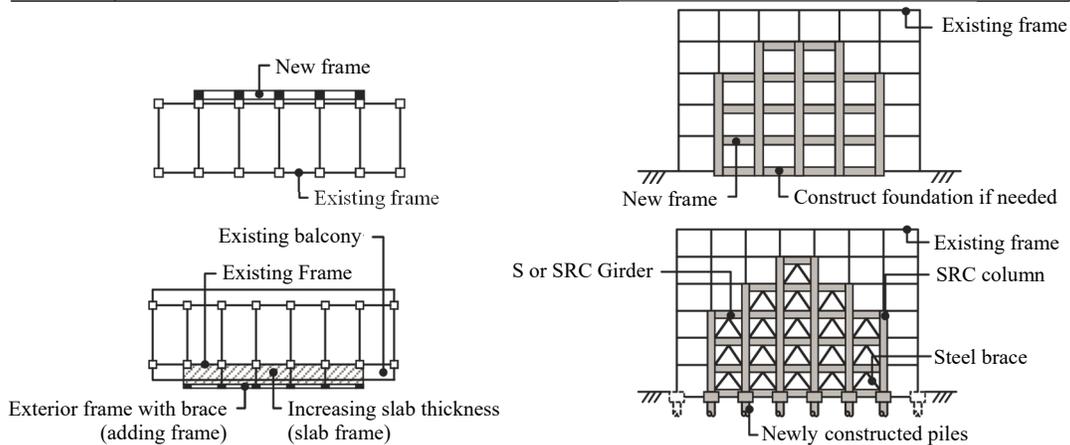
Exterior Frame and Exterior Frame with Brace (adding frame) (reference 2)).
